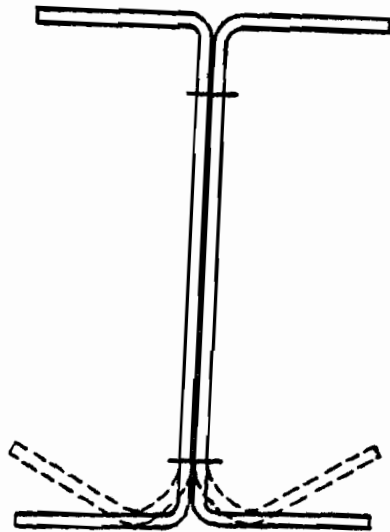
Sketch Showing Failure at Web-Flange
